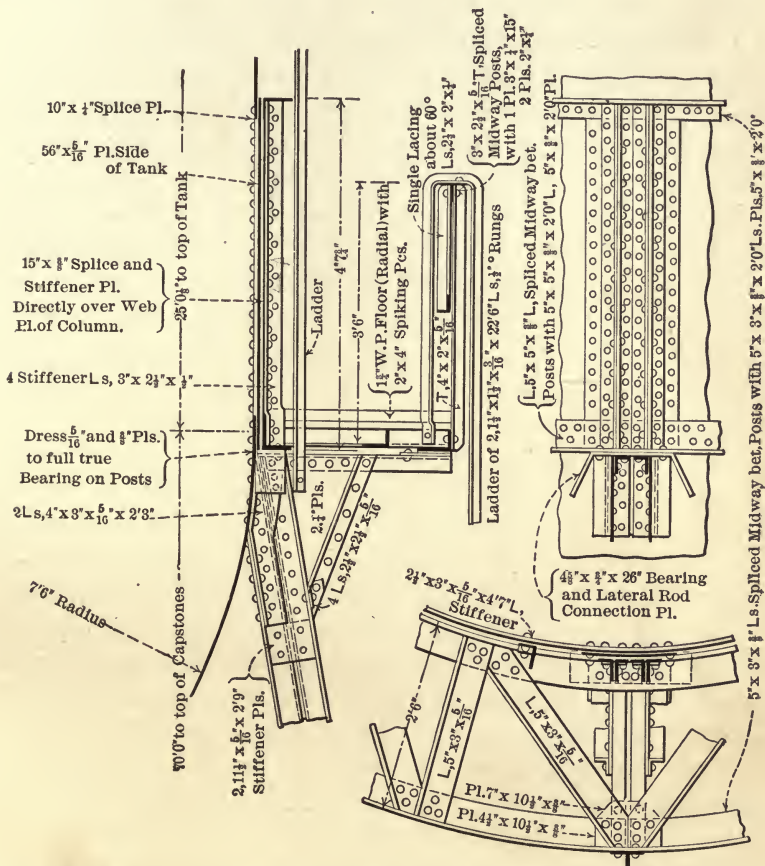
Detail of Junction Between Sides and Bottom of Elevated Steel Tanks. (Designed by Prof. A. Marston.)
